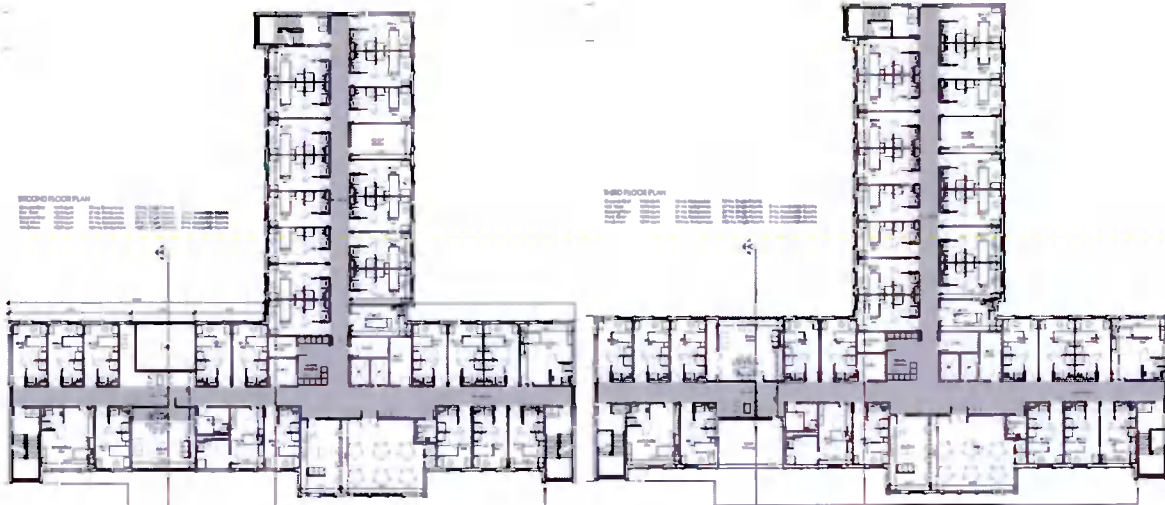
Second (left) and third (right) floor plans of the proposed Nursing Home.
